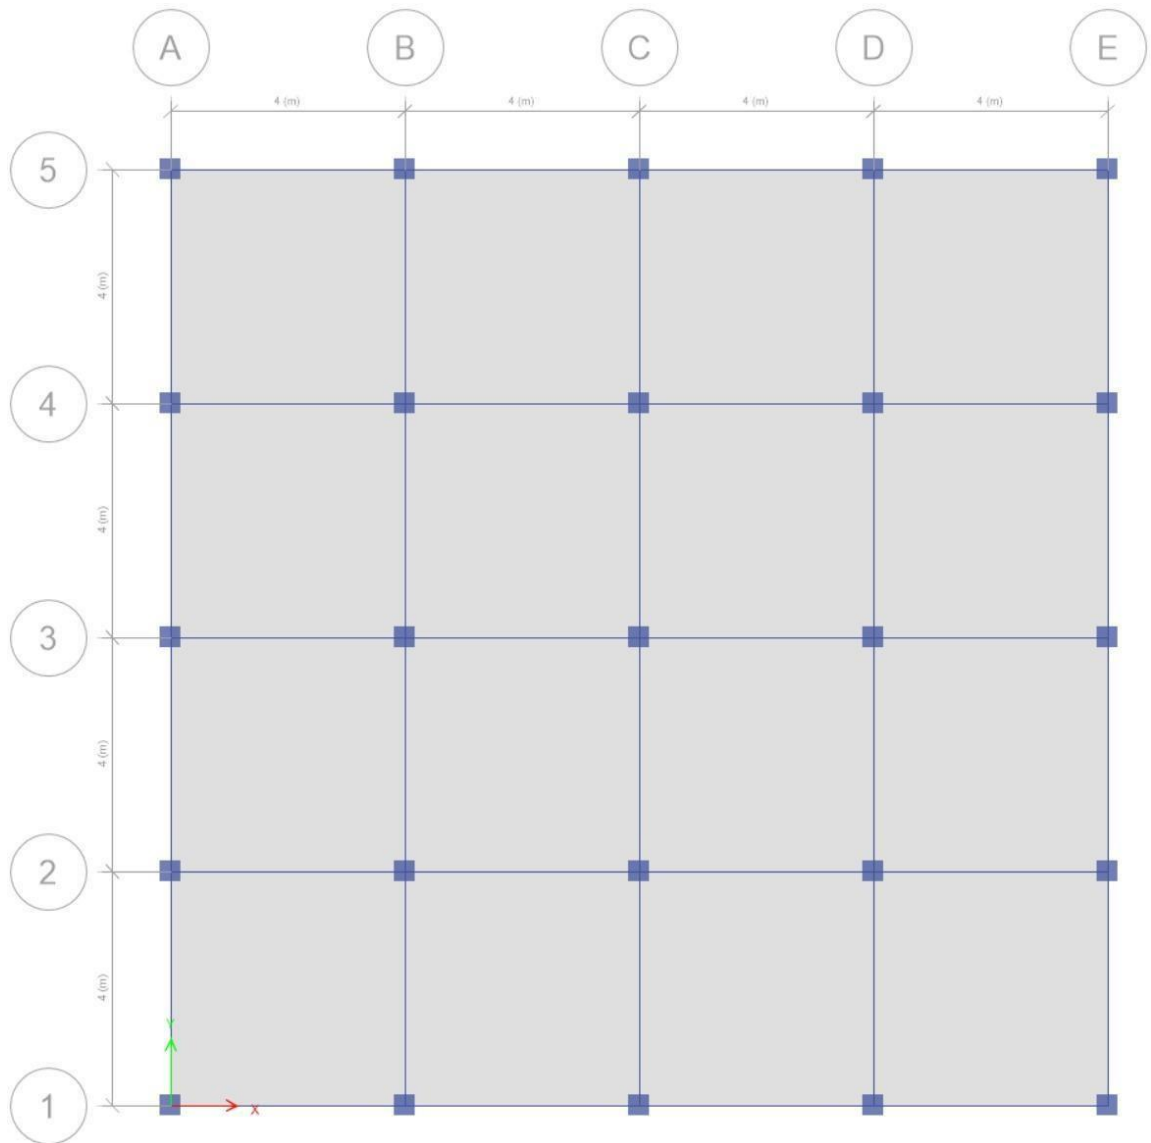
shows the plan of the G+7 story building, highlighting the column layout
